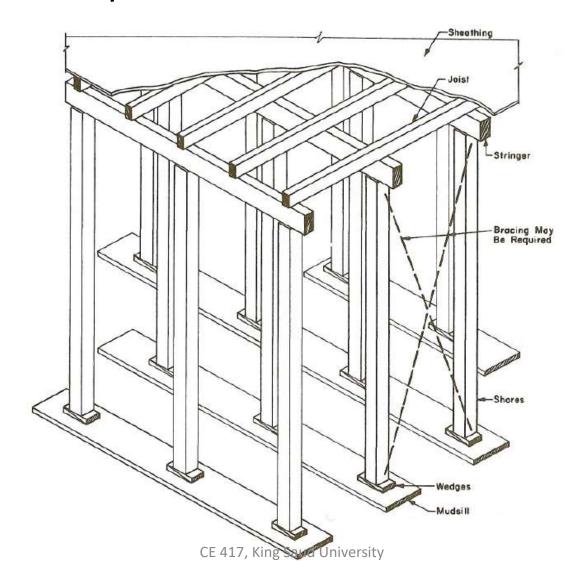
Beam and slab form. (Courtesy of American Concrete Institute)
